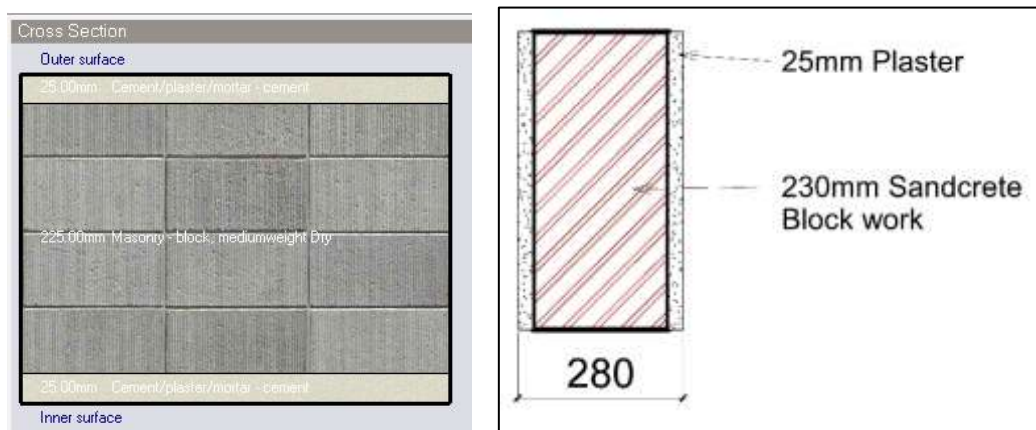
Wall Cross Section of Base Model (Authors Sketch; Design Builder & Revit).
